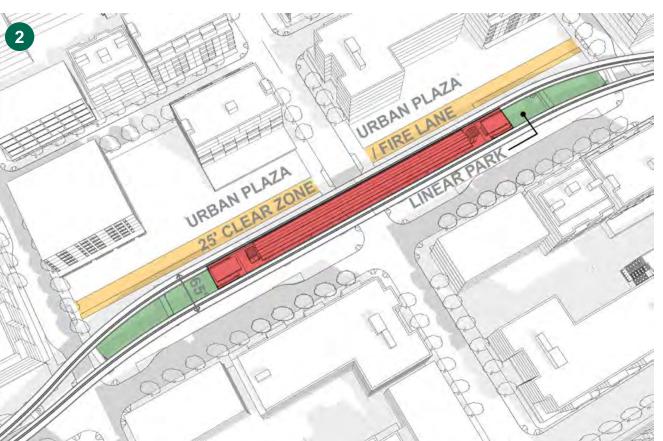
D - Elevated Station outside of ROW
